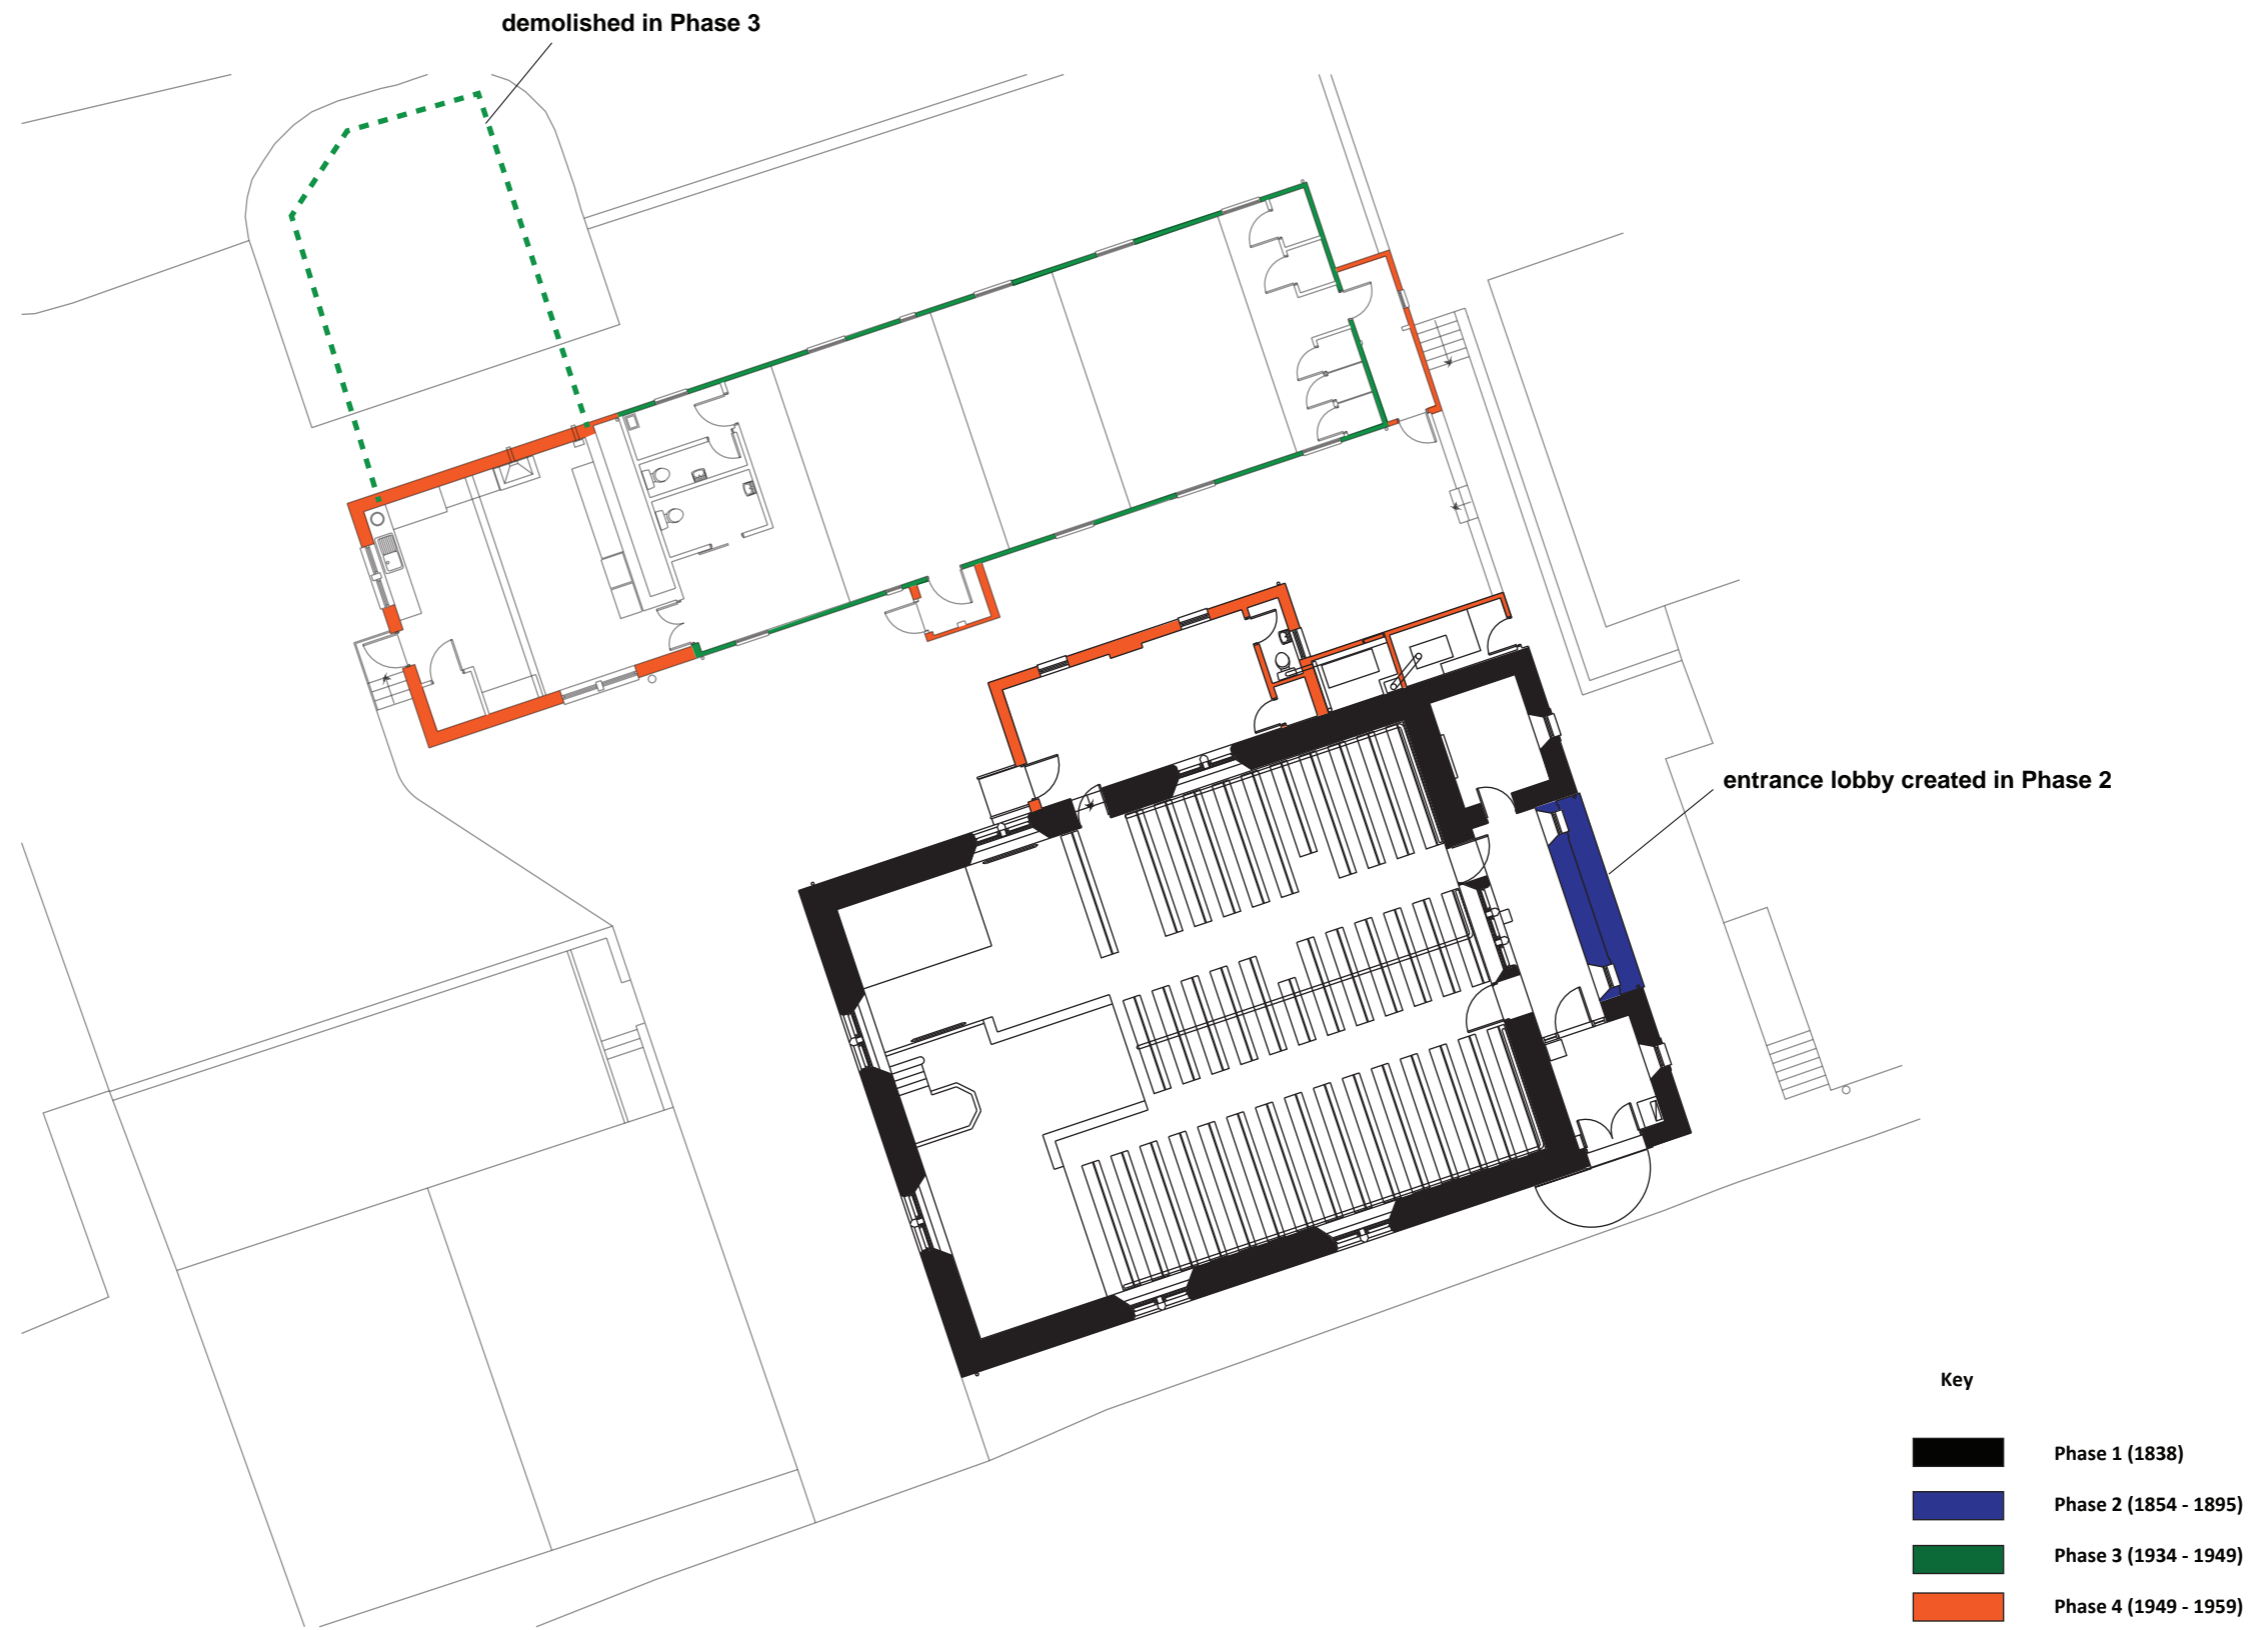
Cockenzie Old Parish Church and Hall, Ground Floor Phase Plan
